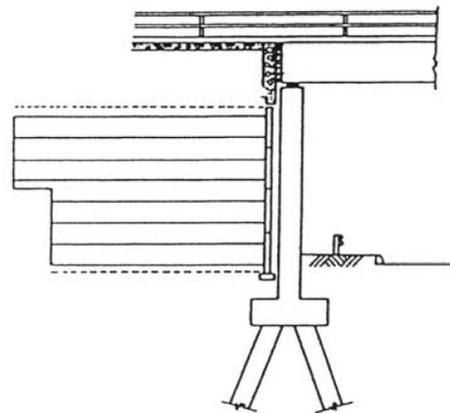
Alternatives to integral full-height wall abutments using reinforced soil retaining structure. (Nicholson et al. 1997)
